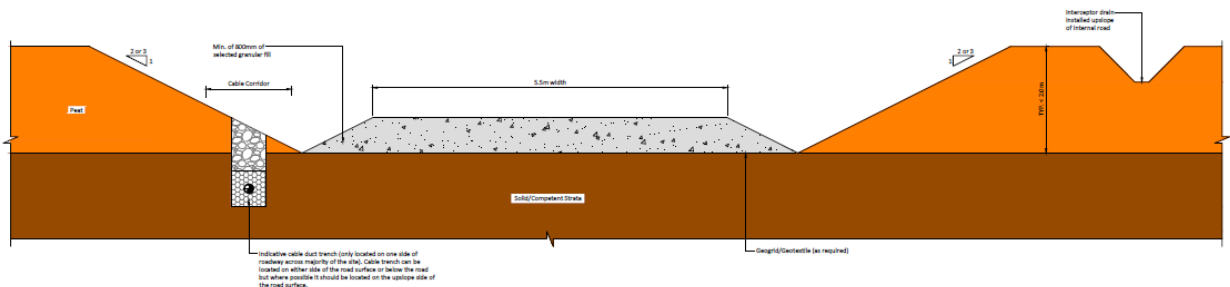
Drawing nr. P20-216-0600-0016, showing construction of road type A (marked in yellow in image 3)
